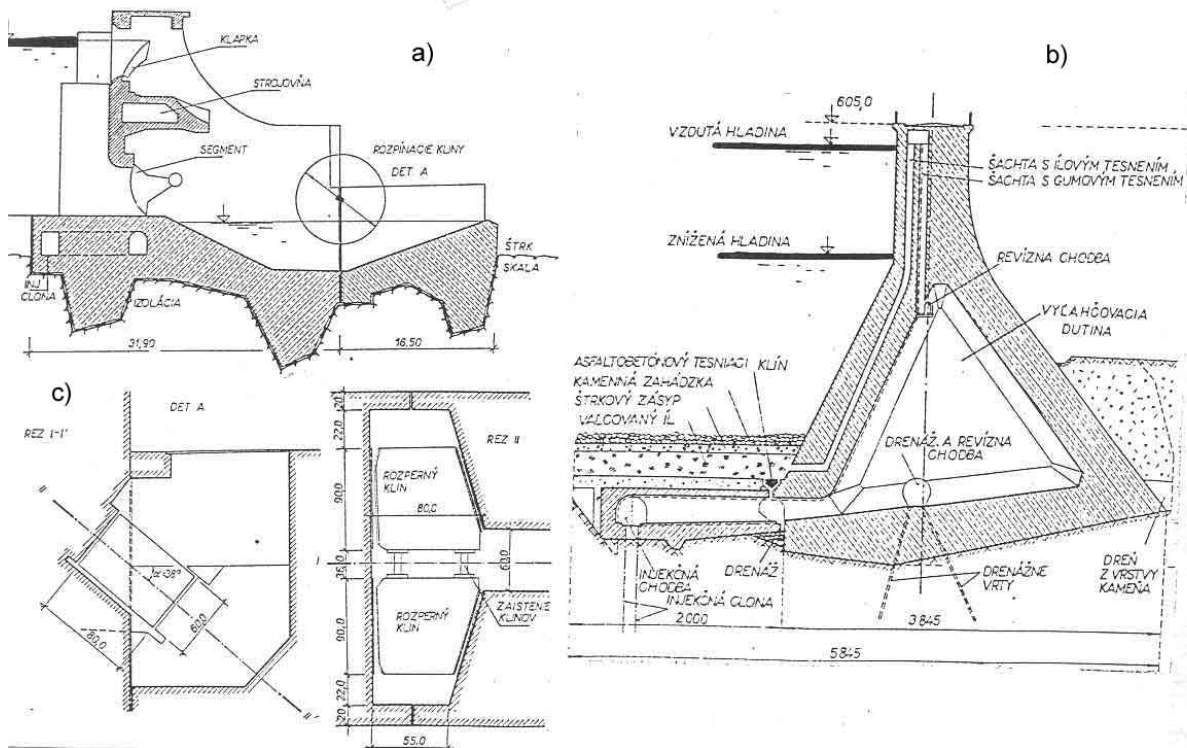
a) cross-section of the Nosice dam, b) cross-section of the Orava dam, c) constructional detail of the Orava dam – bracing wedges
